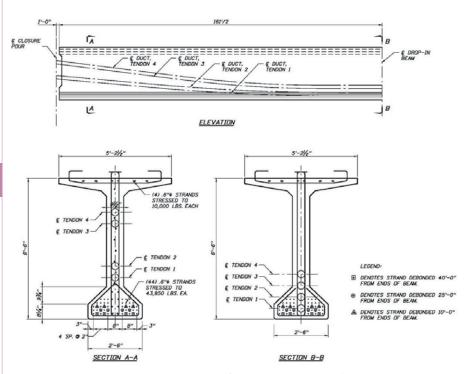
Elevation and cross section of the drop-in girder (1'=305 mm, 1"=25.4 mm)
